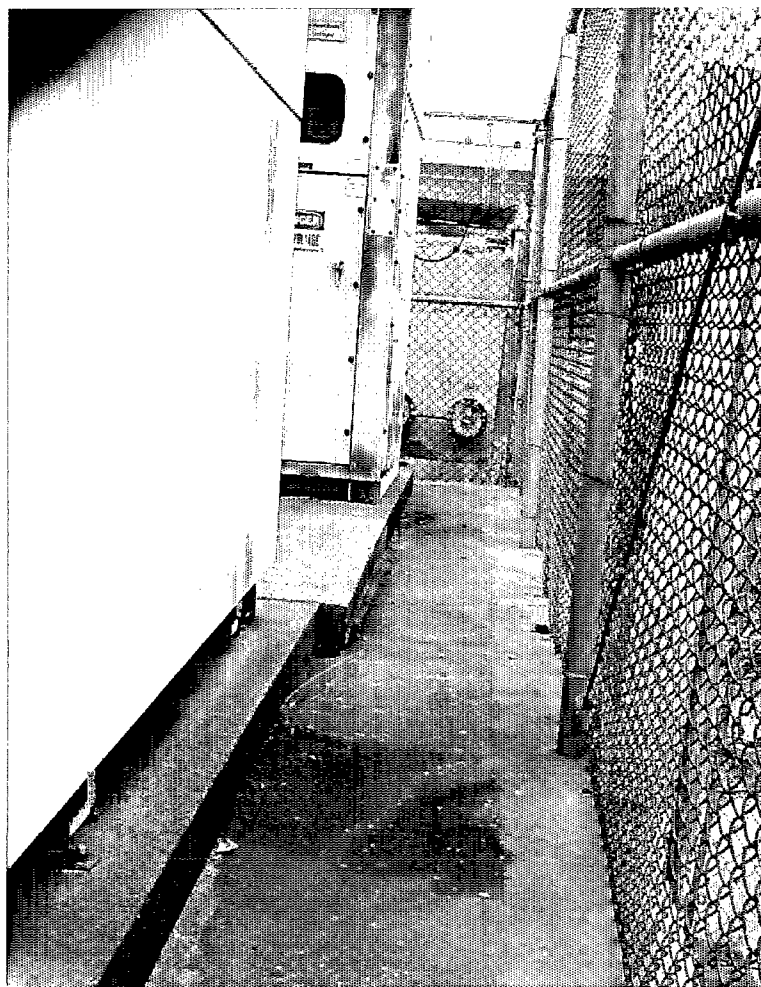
The northwestern portion of Building 844 UL#01, looking southwest
